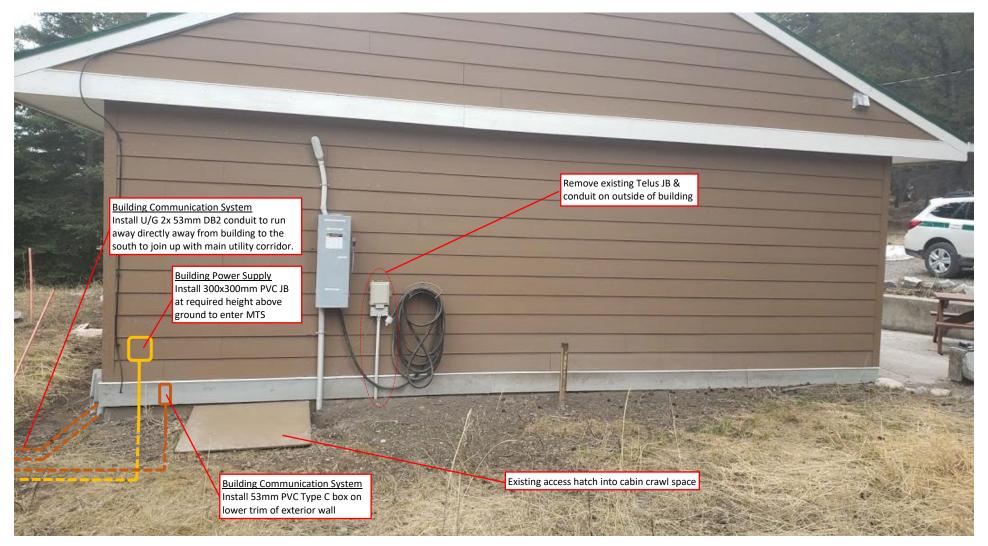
Garage D Utility Tie-In Details (South Side of Building)
